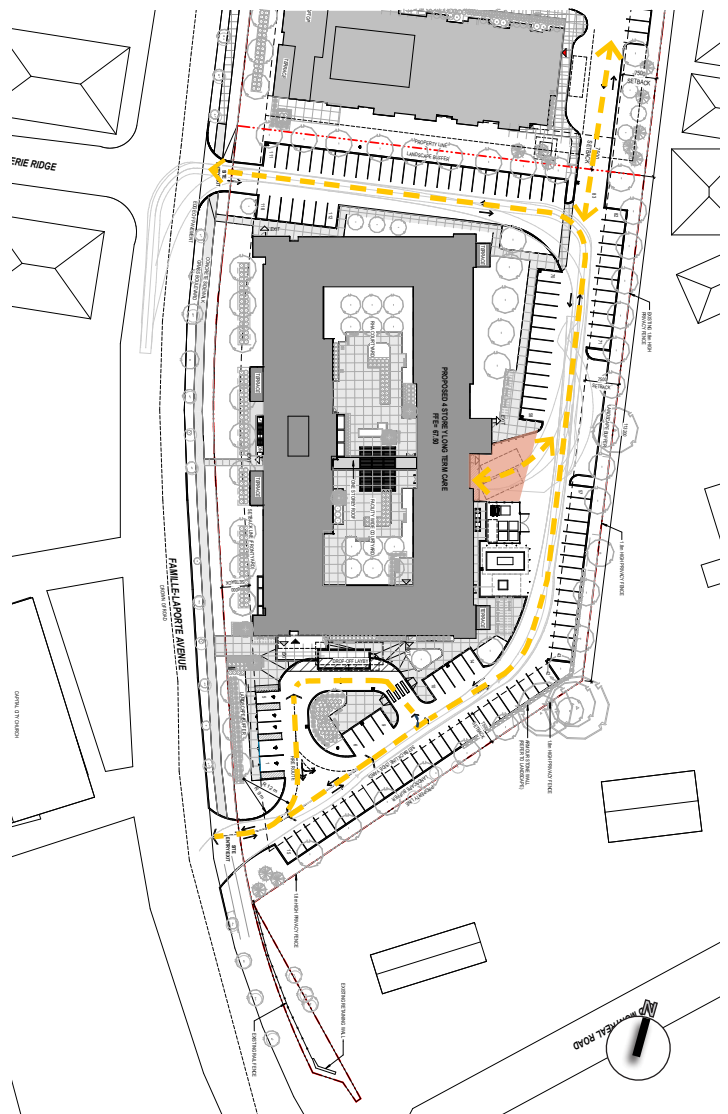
Site Plan showing vehicular movement and loading areas
